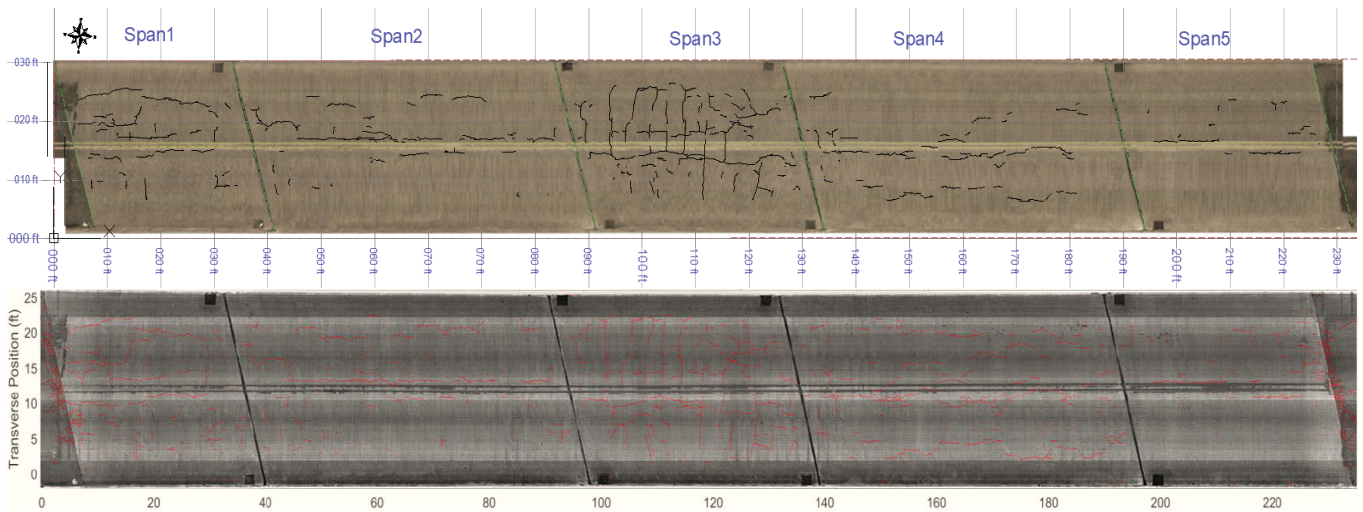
Existing Cracks of Bridge Deck No. 22387- Overall View Image
